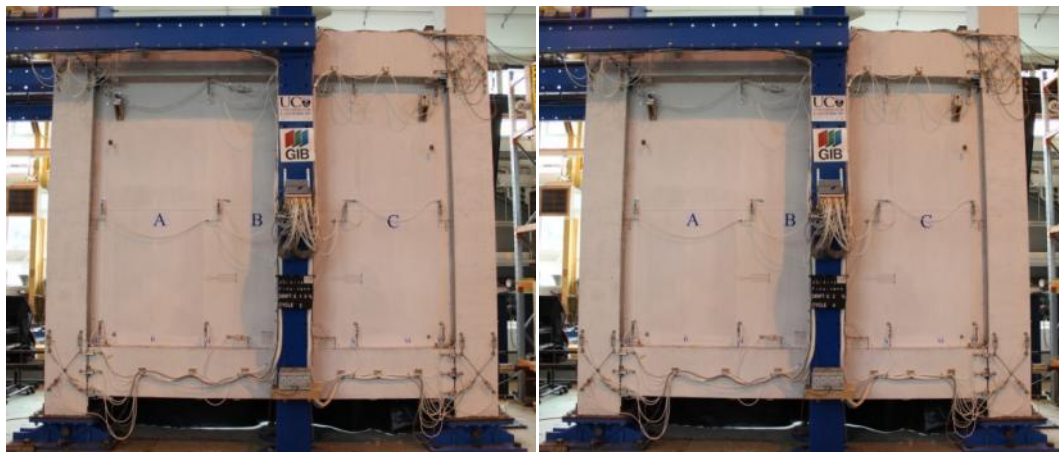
As built timber framed drywall specimen FIF2-TBFD: Installation of the timber elements
